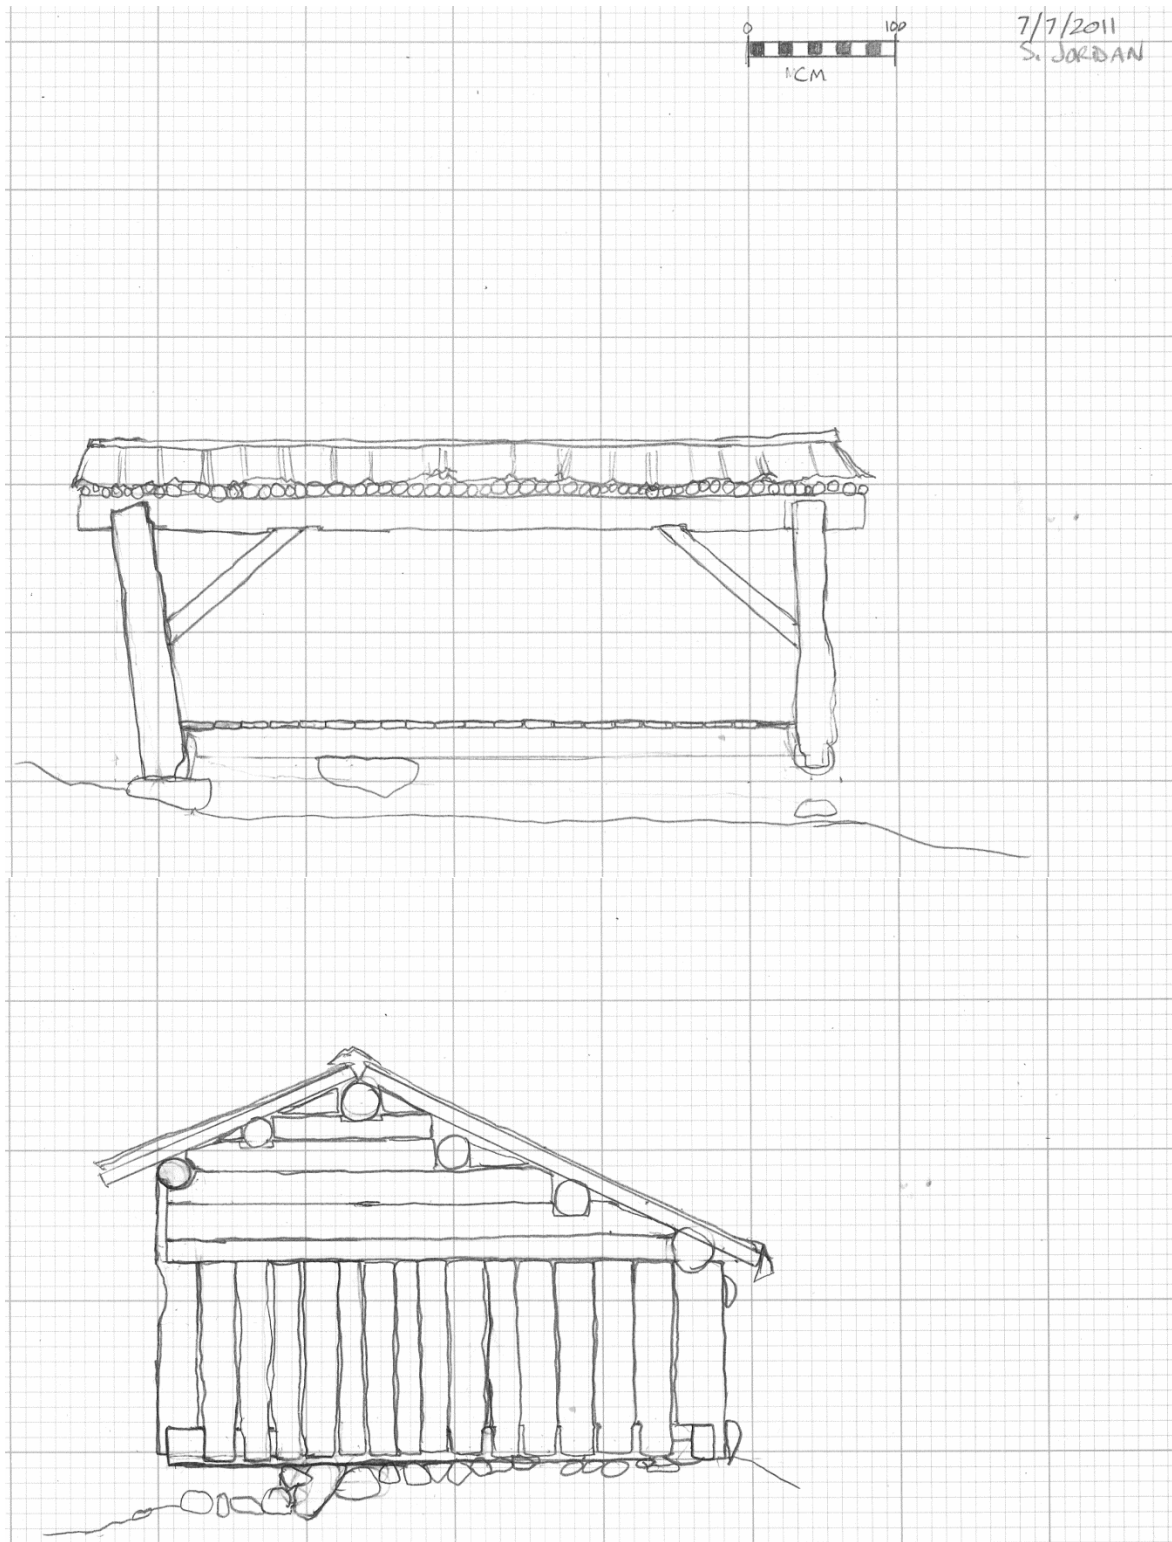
Mountain Pond shelter drawings. Above: South (front) elevation. Below: East side elevation. July 7, 2011.
